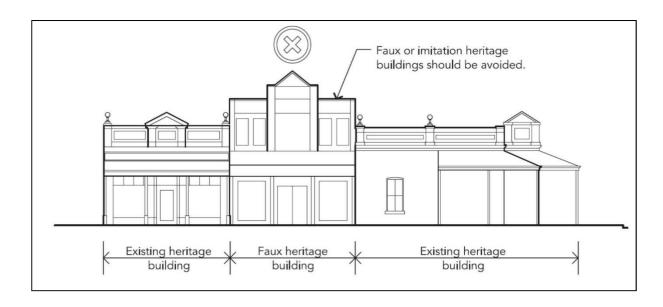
Street elevation illustrating incompatible faux heritage development.
